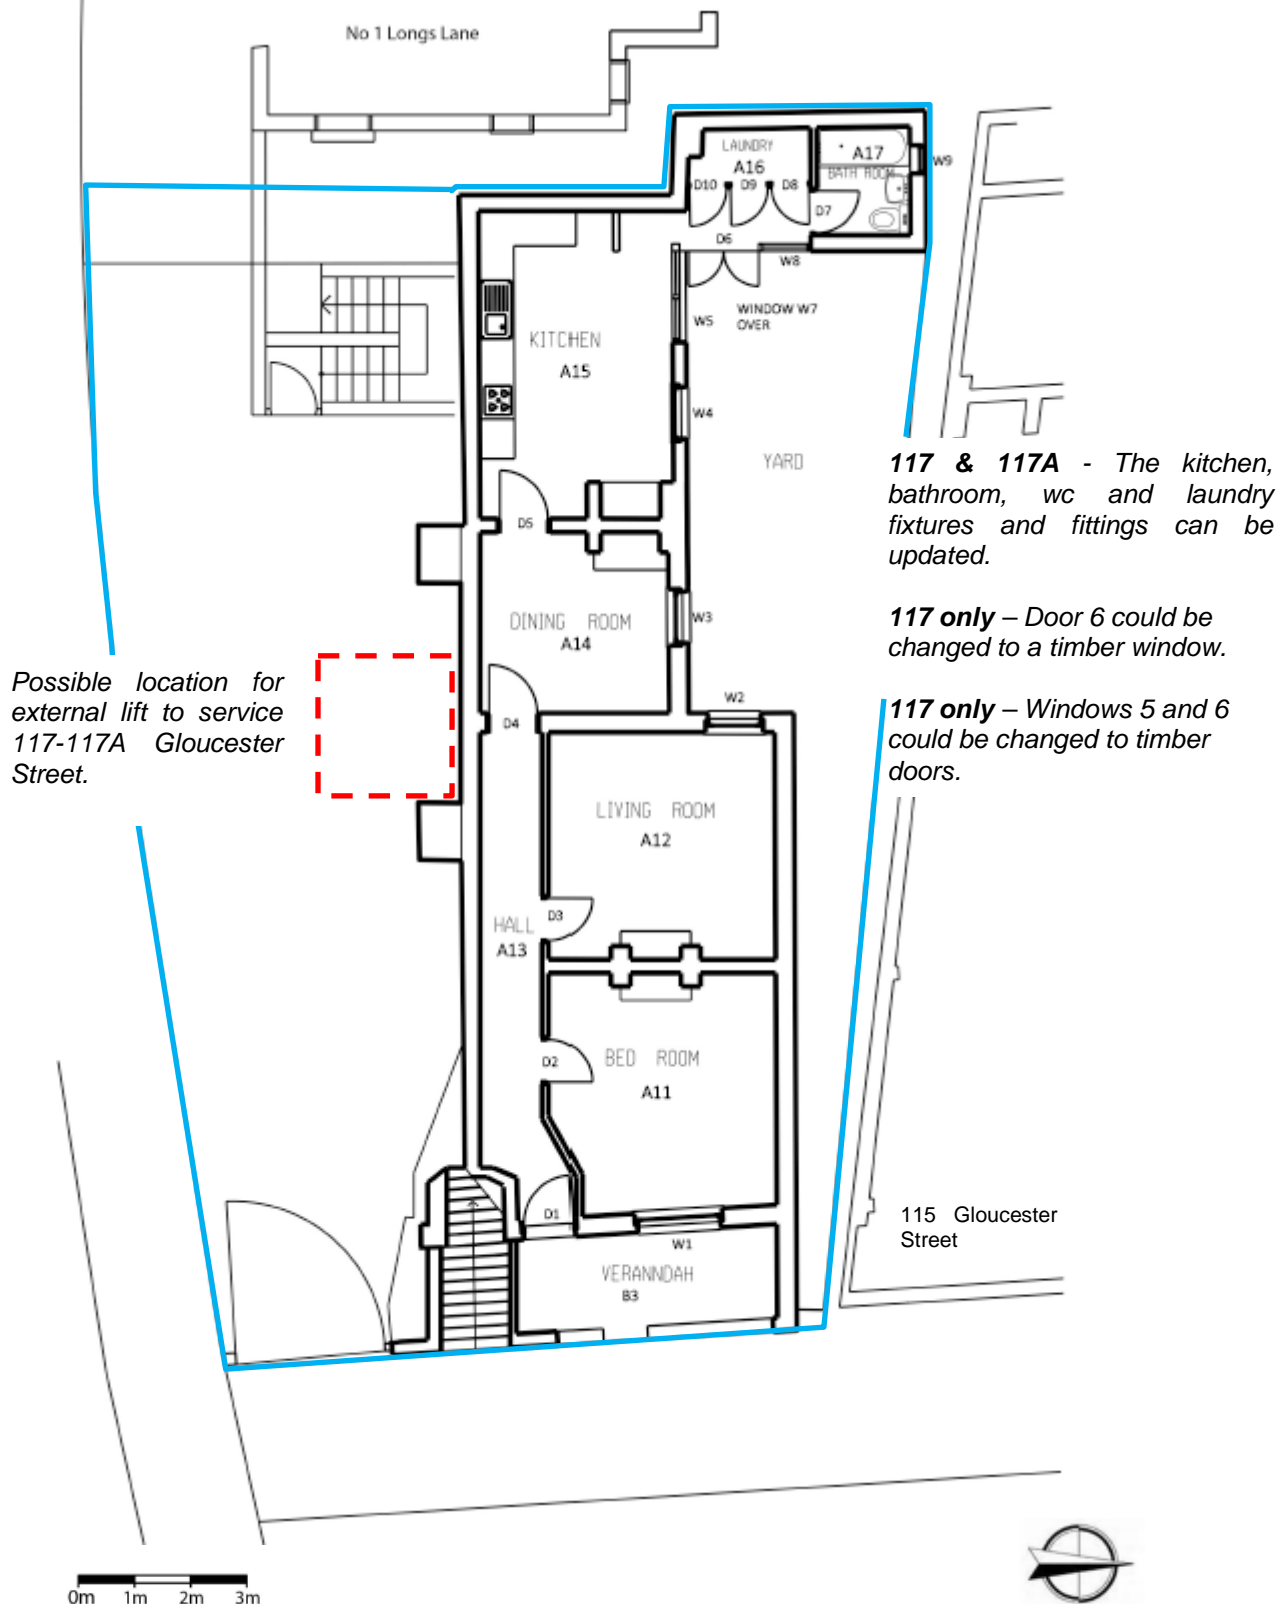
Figure A: Ground floor and site plan for 117 and 117A Gloucester Street showing possible changes. SHR heritage listing boundary shown in blue. Source: Sydney Harbour Foreshore Authority.
